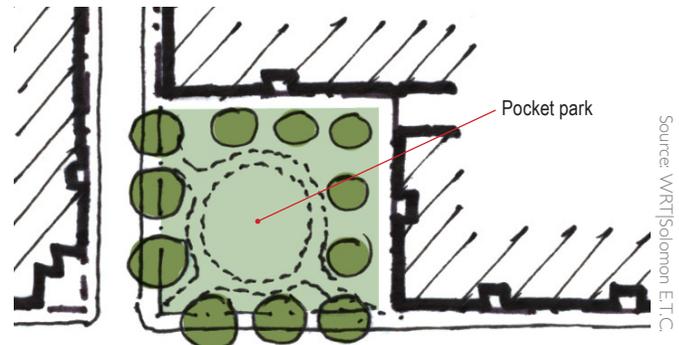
Pocket parks should be accessible from the public sidewalk.
